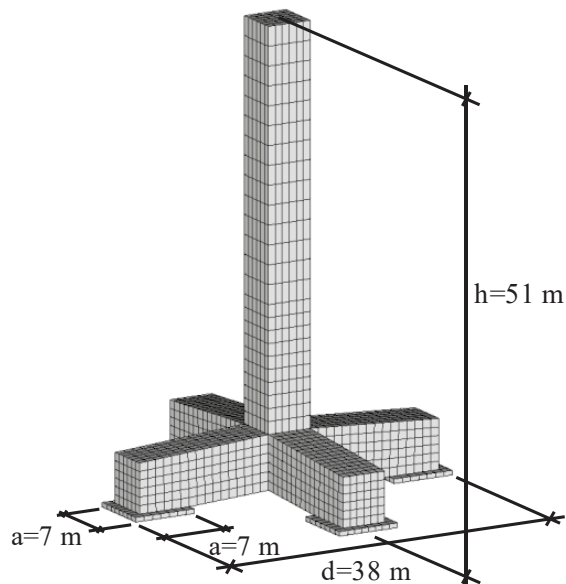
Geometry and dimensions of the concrete foundation, Sturm (2011)
